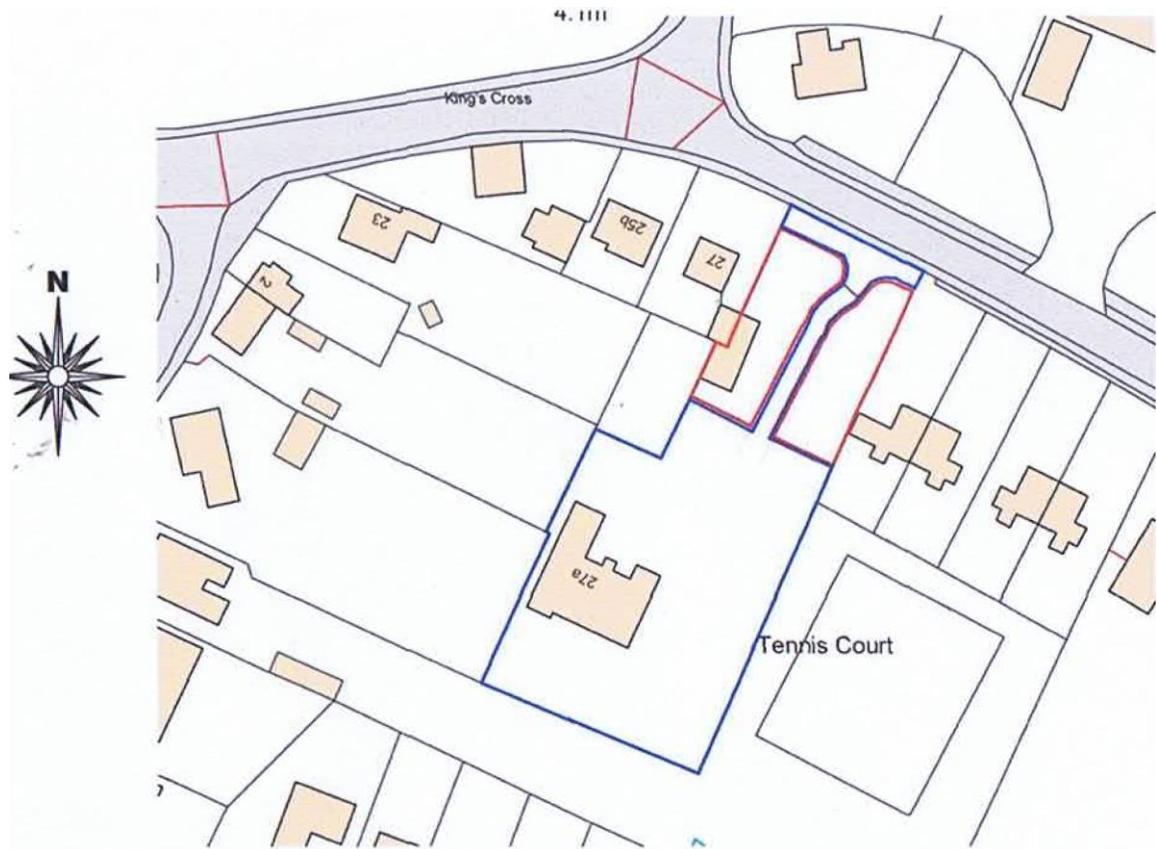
Plan showing the location of the proposed development site at a scale of 1:1,250, (extract from Architects plan)
